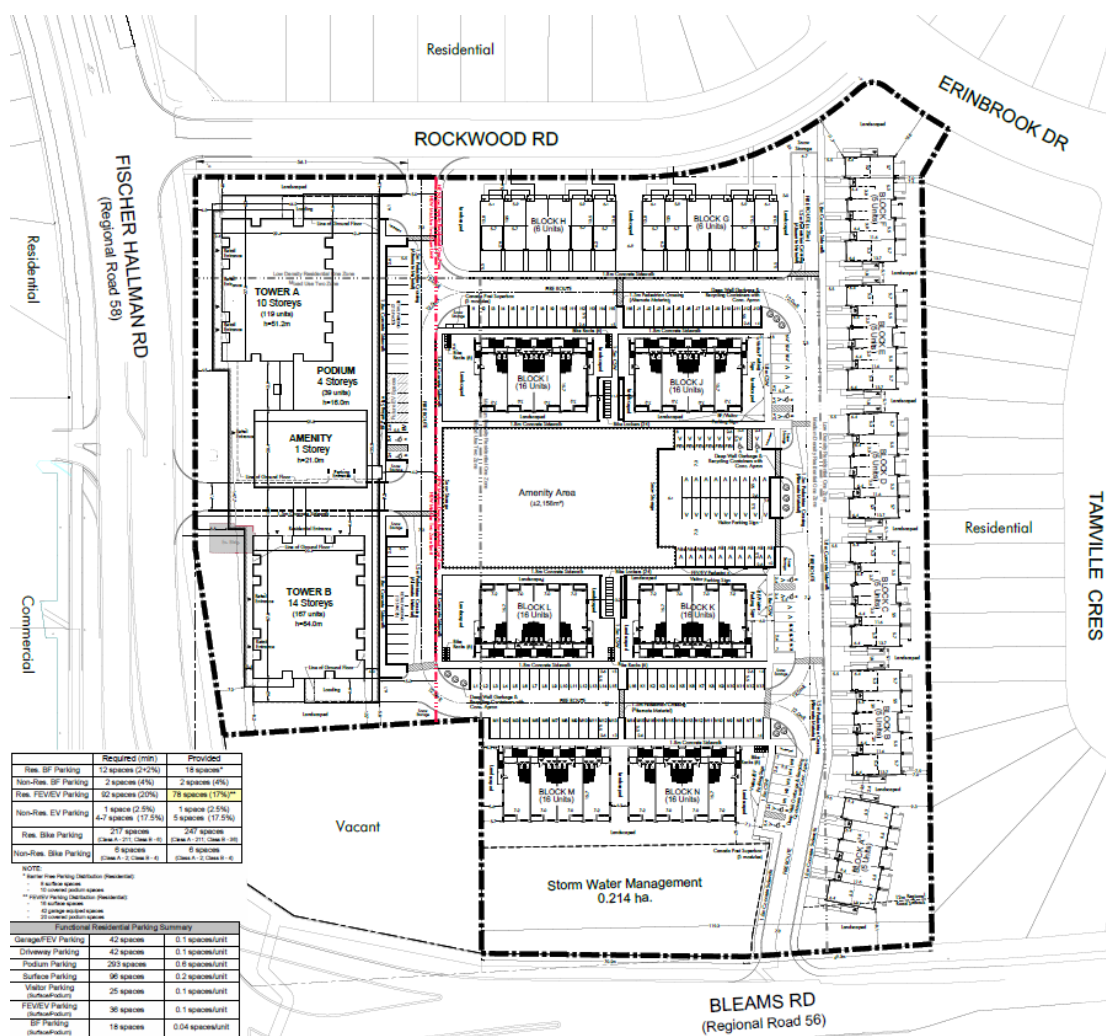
Proposed site plan for proposed development (MHBC, November 10, 2022)
